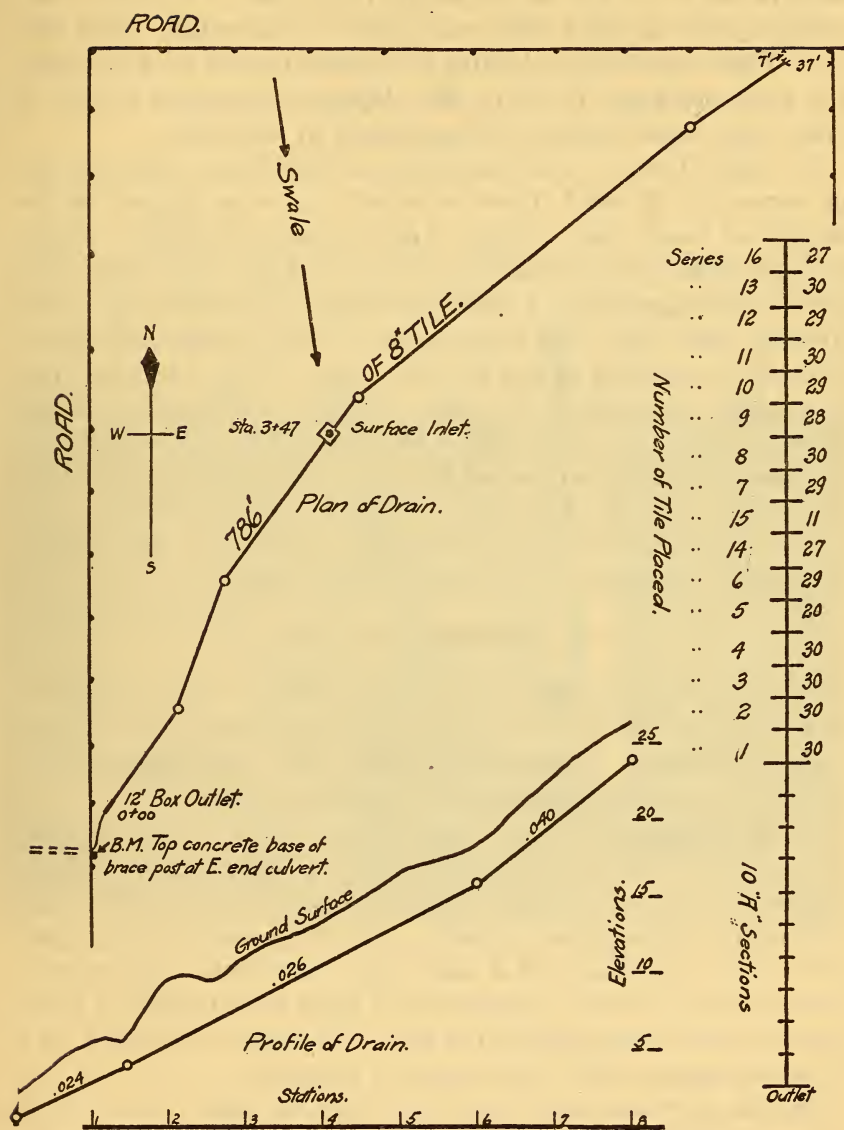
Showing location, plan, profile, and arrangement of experimental drain tile at Columbia, Mo.
